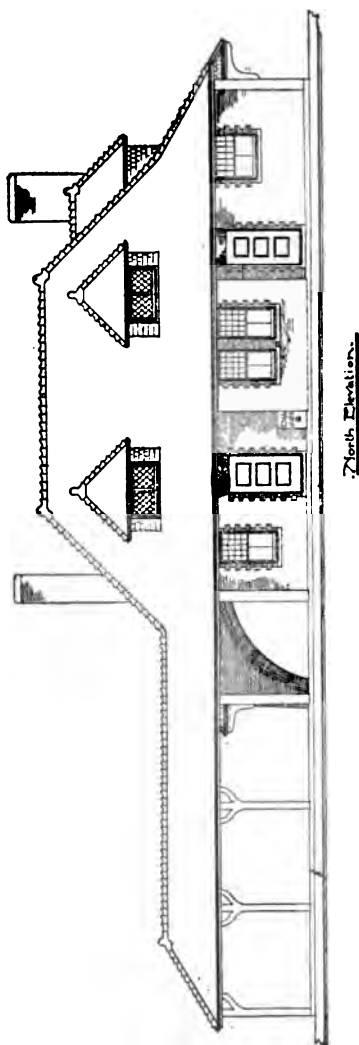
TRACE SIDE ELEVATION OF LOCAL DEPOT AT OAKDALE, LONG ISLAND R. R.
